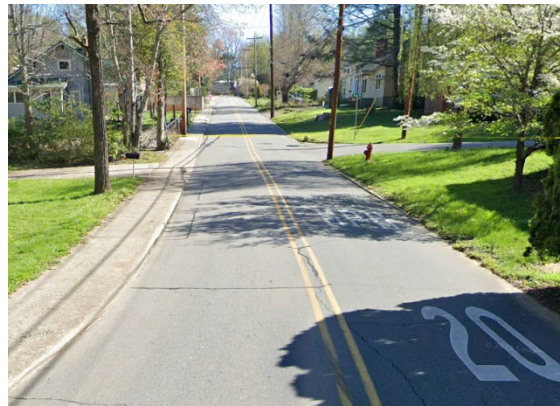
East Street Section 2 image looking from Happy Hollow Street
